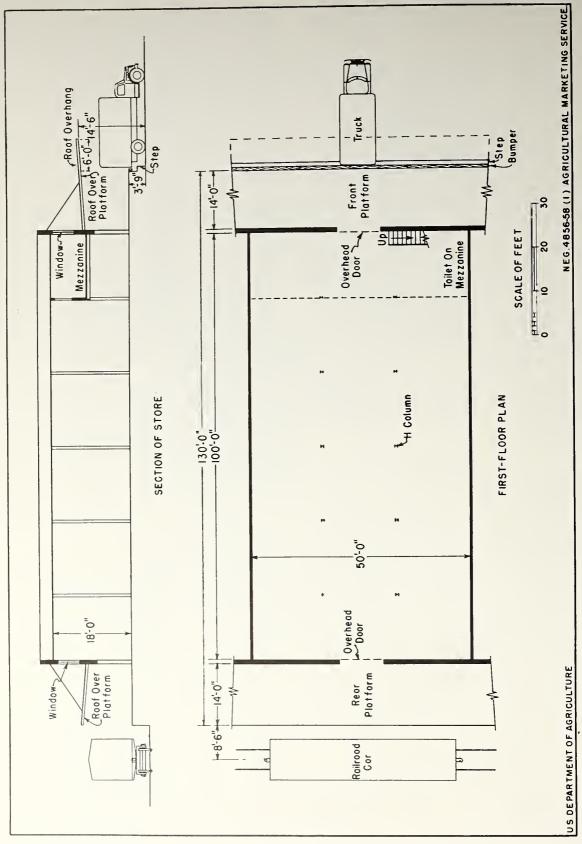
Possible floor plan for multiple unit dry grocery store.
